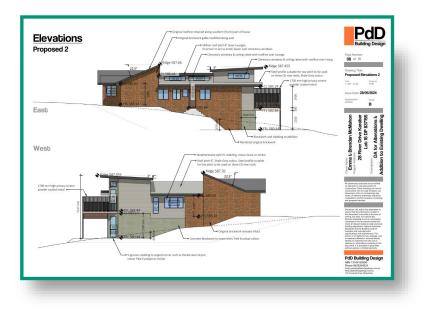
proposed elevations east & west source: Paul Dolphin Designs
